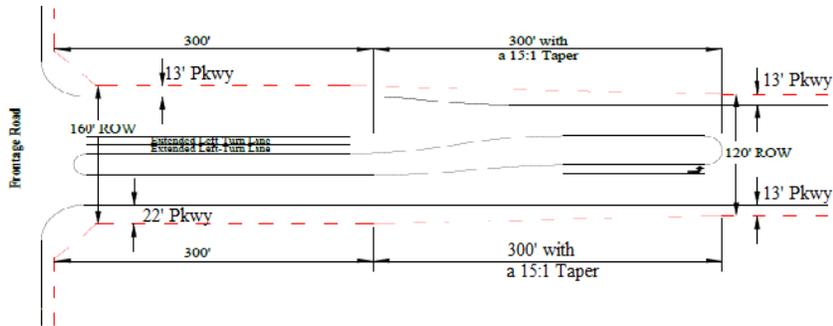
Type 6LD Thoroughfare Intersection with Frontage Road
